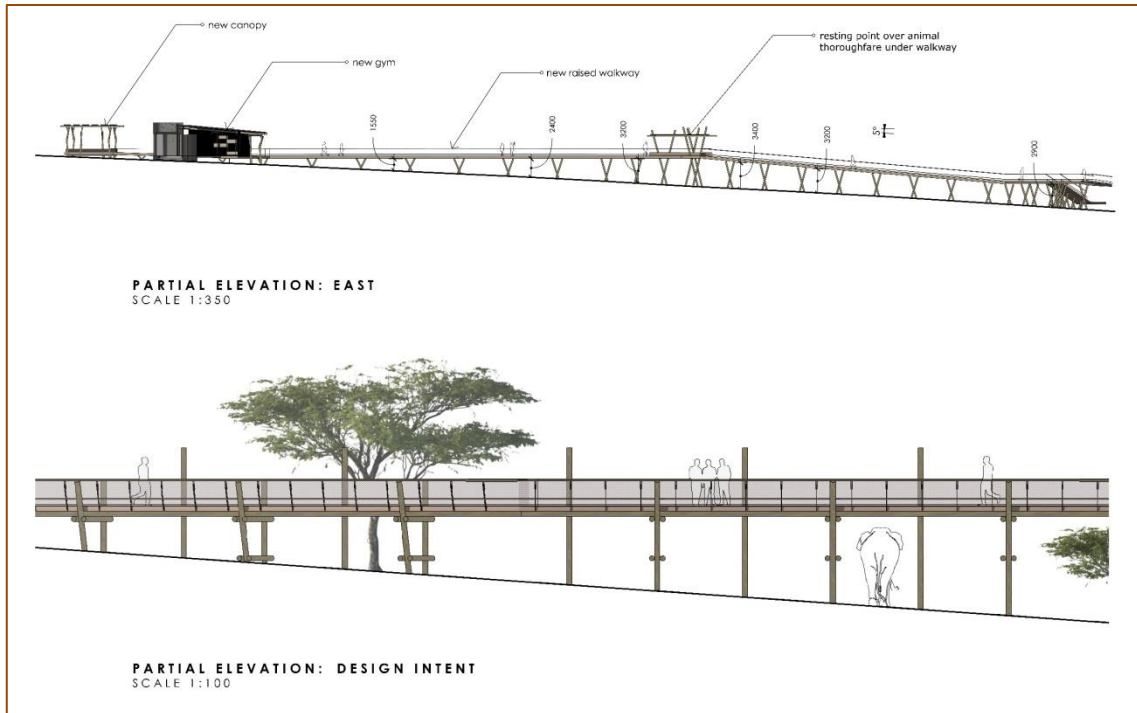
Artist's impression of the proposed new raised wooden boardwalk linking Ebony and Boulders Lodges via the new boma (© GAPP).
